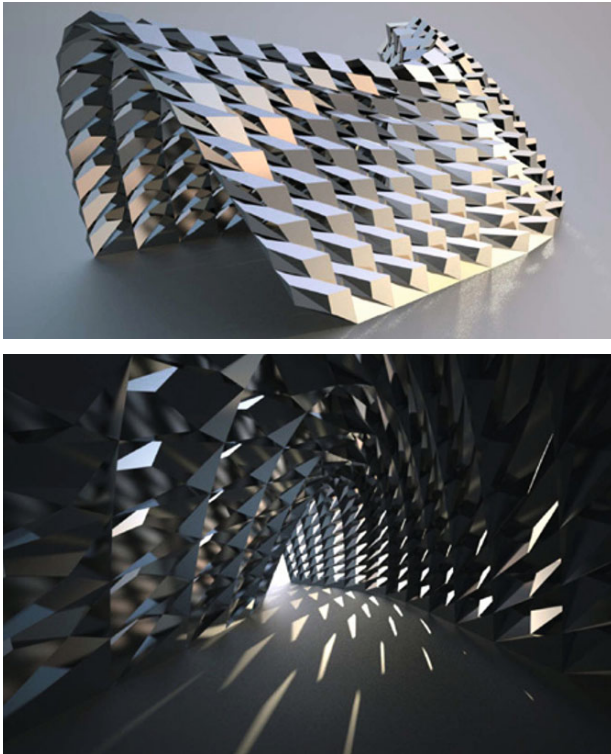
Application of Plega in a pavilion. a, above) exterior view; b, below) interior view
